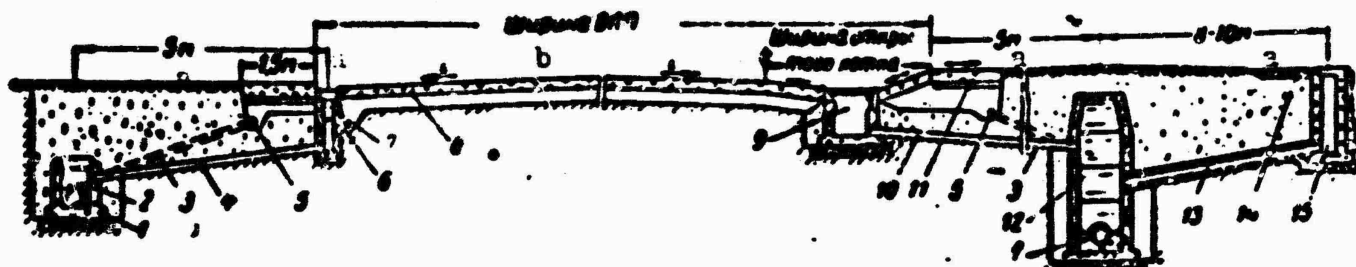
Elements of a water draining network. 1) Sewer; 2) blind chamber; 3) connection to the subshoulder drain; 4) drainpipe from covered gutter; 5) subshoulder drain; 6) drain of the covered gutter; 7) covered gutter; 8) runway pavement; 9) catch basin; 10) drainpipe from catch basin into the sewer; 11) macademized soil shoulder; 12) access gulley; 13) drainpipe from drainage inlet; 14) macadam side path; 15) drainage inlet.
